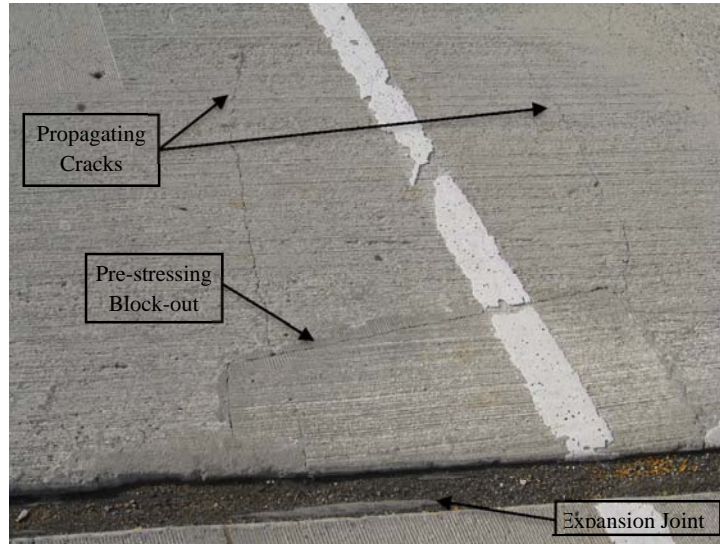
Top view for box girder deck illustrating crack propagation from pre-stressing block-out.
